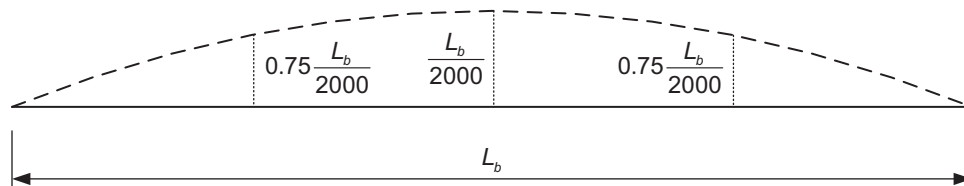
Recommended one-half tolerance flange sweep imperfection.
